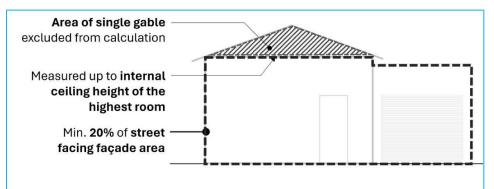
a: Street facing façade area – single storey unit
